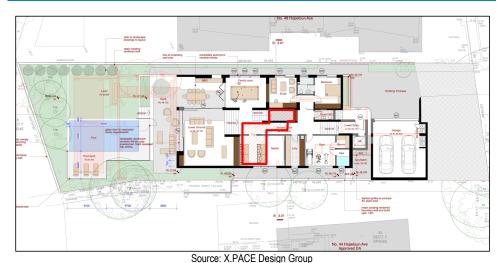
Proposed Lower Ground Floor Plan Showing Location of Existing Basement Below (in Red)
